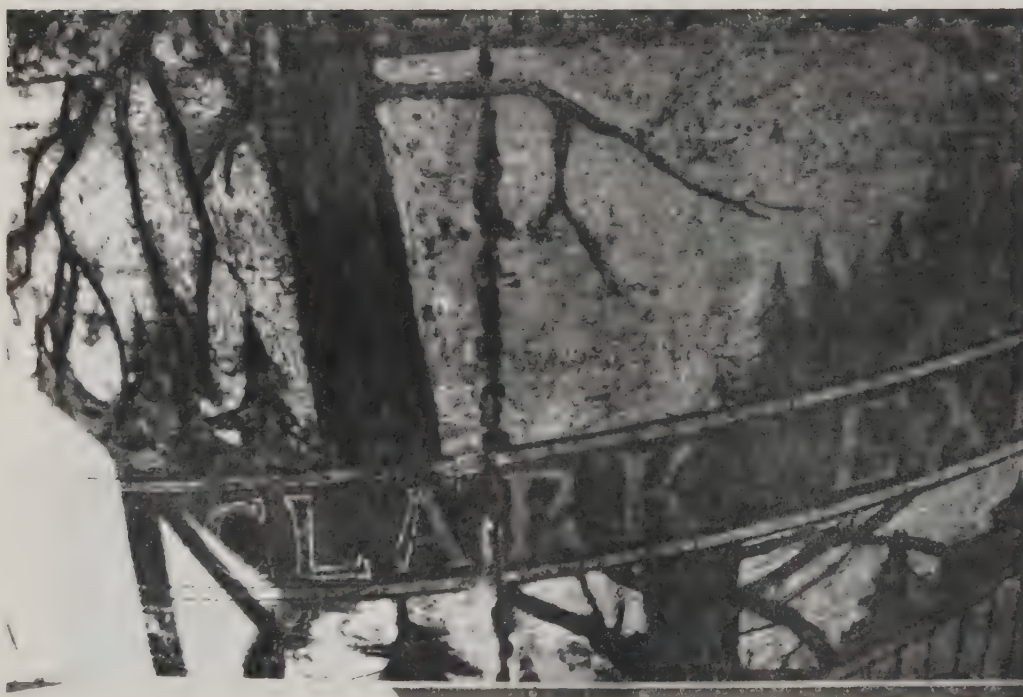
Photo Astoria Column Detail Lettering Partly Lost-AUG 1989
